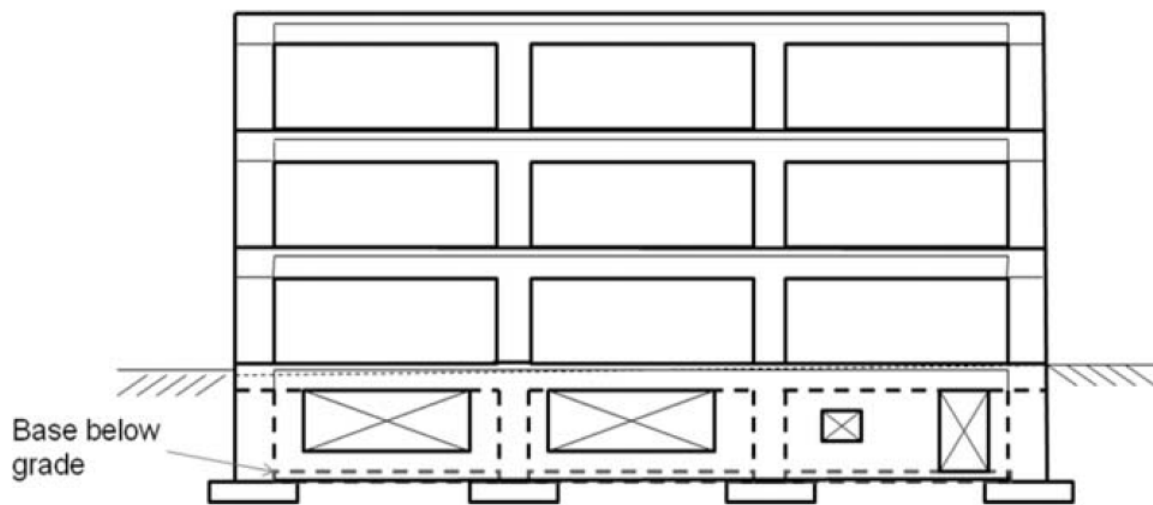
Base below Substantial Openings in Basement Wall.
